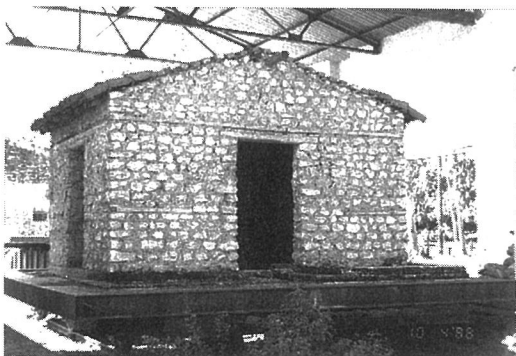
A mud-stone building constructed for an experimental study at the University of Roorkee, India
